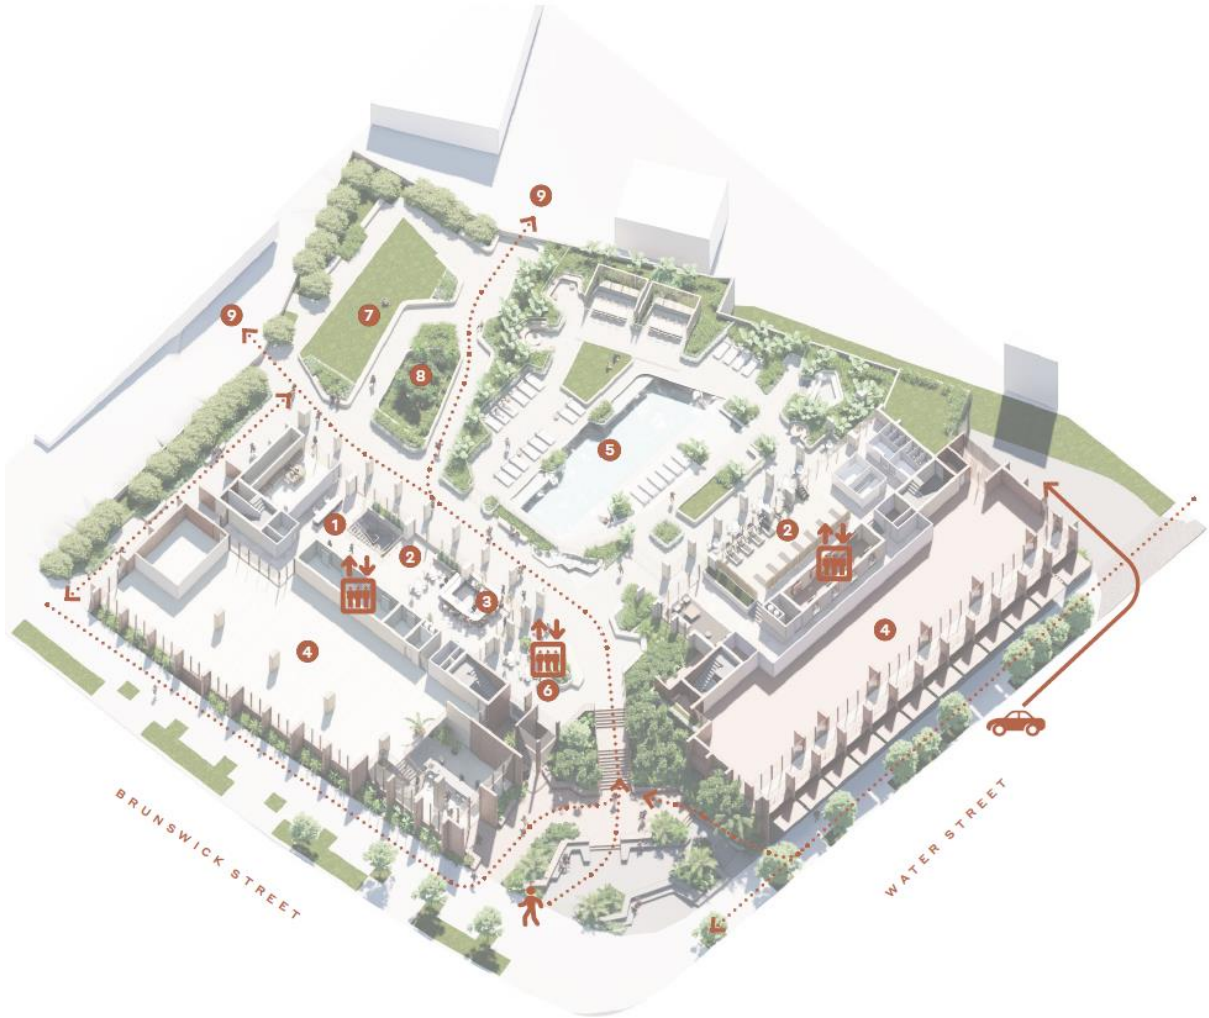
Ground Floor Plaza Perspective (Significant Corner along Brunswick Street & Water Street)
